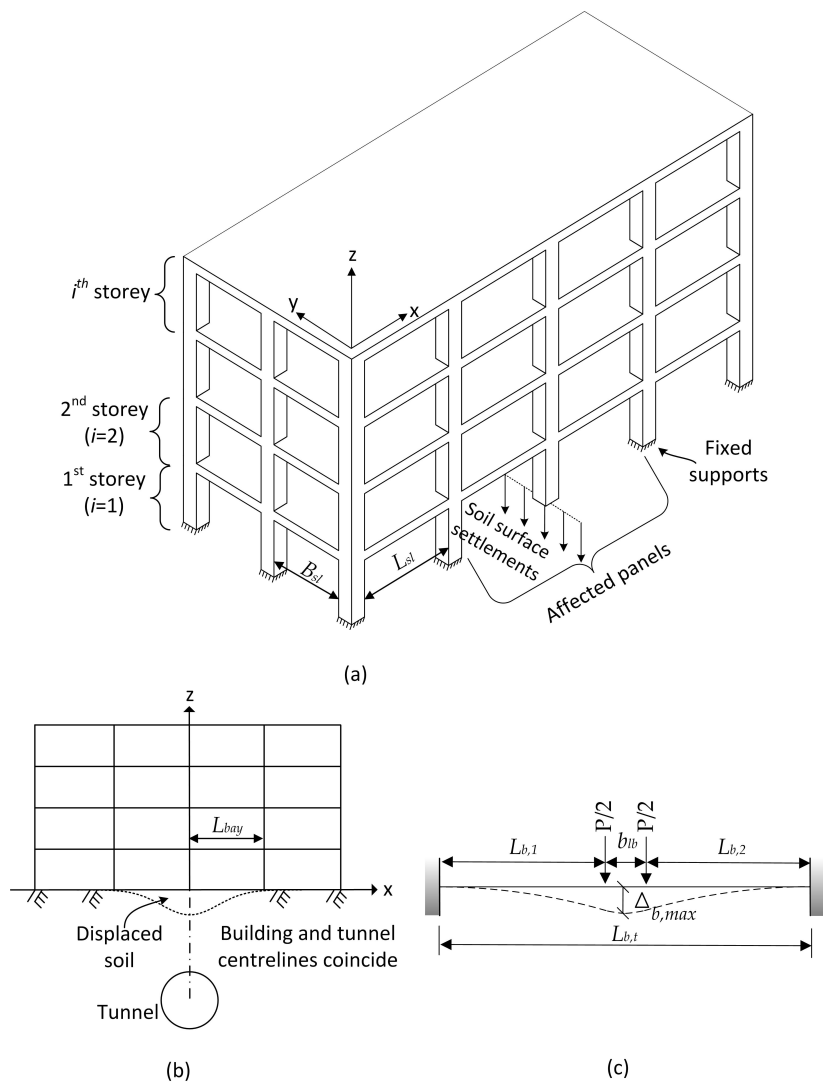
(a) Isometric view of framed building, (b) 2D view of building and tunnel, and (c) fixed-ended beam
